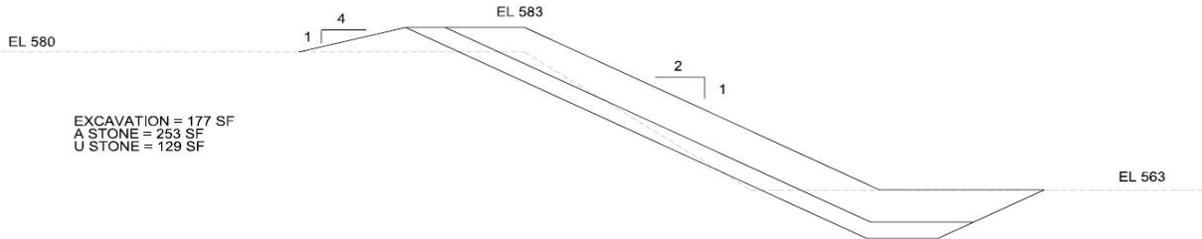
Typical Section Proposed Revetment up to ODNR Design Standards.
